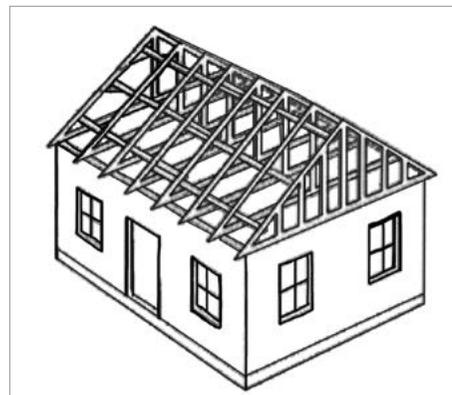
Trusses are built with a peak at the ridgeline of the house. The trusses at the end of the house form an A-shaped pattern know as a gable end. During a hurricane, the gable end is subject to great forces from the wind and could tip over, collapsing the other trusses in a domino fashion. Source: FEMA's Against the Wind brochure 247.
